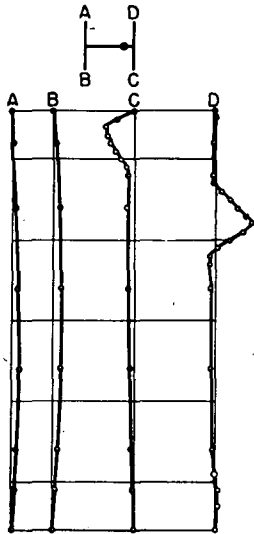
Carbon steel specimens loaded at centroid. Profiles of flanges of columns after failure.
